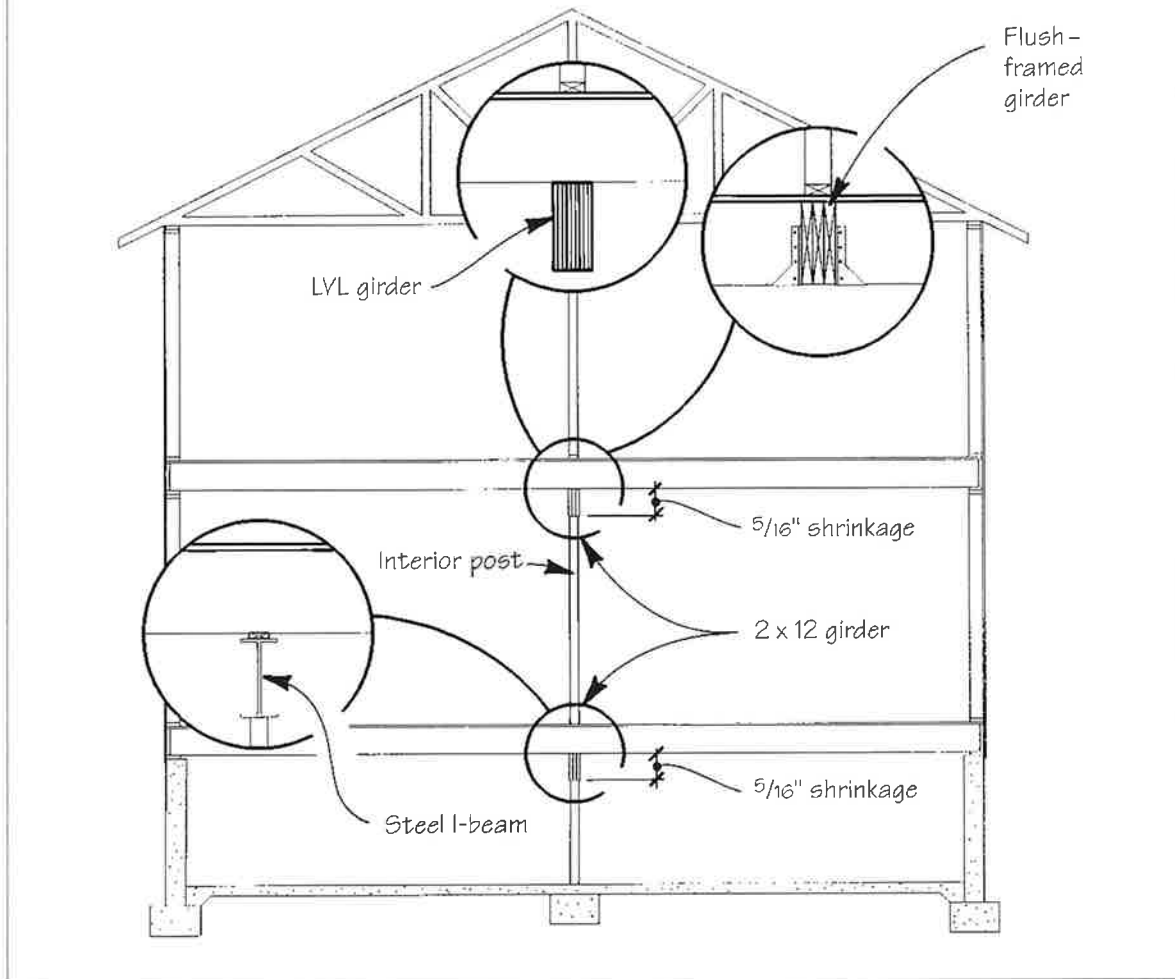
Watch out for situations where wood shrinkage can compound to create noticeable problems. In the house shown here, the two built-up 2x12 girders will cause the center bearing wall to shrink much more than the exterior walls. This will result in a 1/2-inch drop at the second floor level — enough to cause nail pops and cracks in the finishes. Using a steel I-beam in the basement and engineered lumber or flush framing at the second floor will alleviate the problem.
